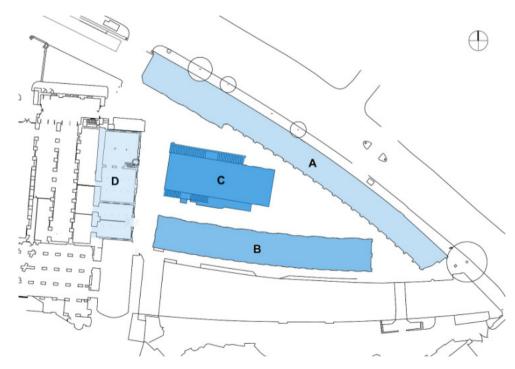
Stables Market - Listed group of buildings, subject site Building D
